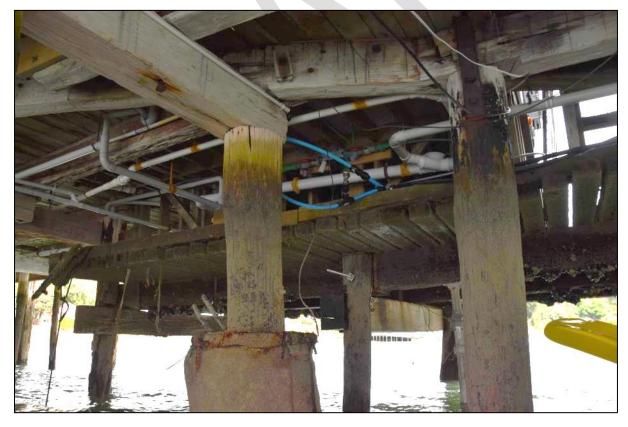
Decay in decking boards beneath the existing deck finish. Corrosion to original iron bolts and nuts.
